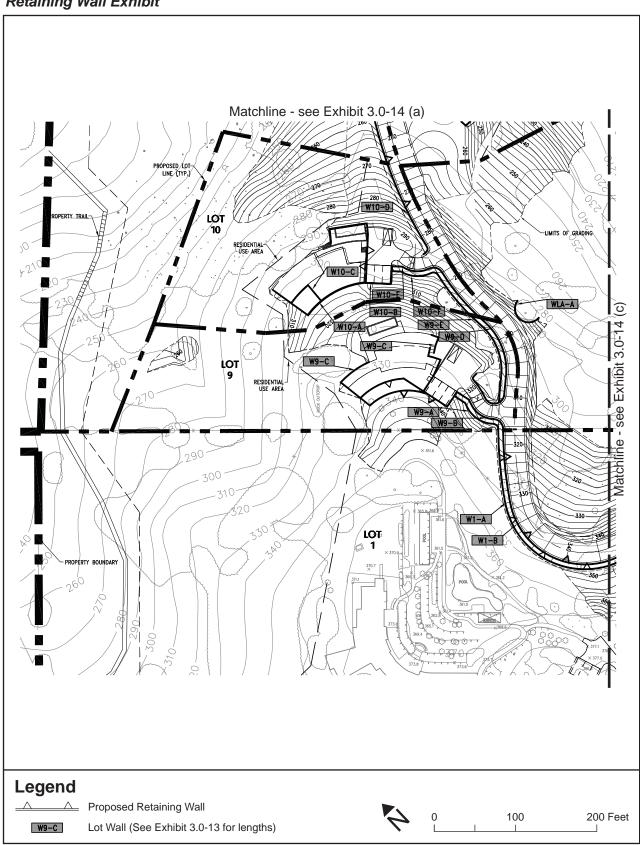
(c) Retaining Wall Exhibit
